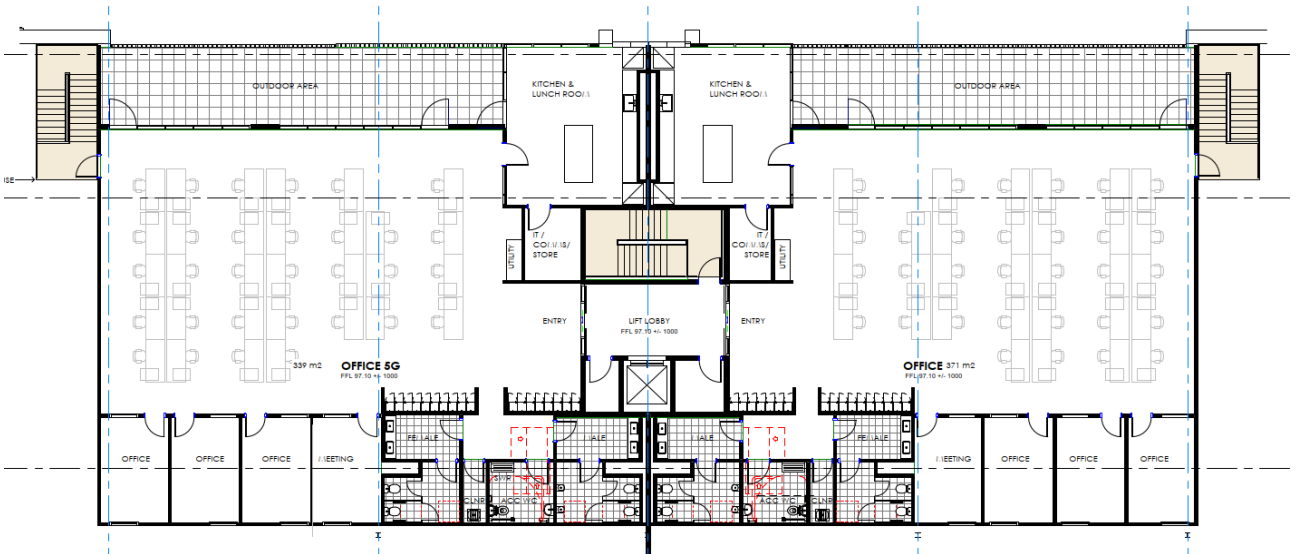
Typical Mezzanine office Floor Plan (office G and H)
